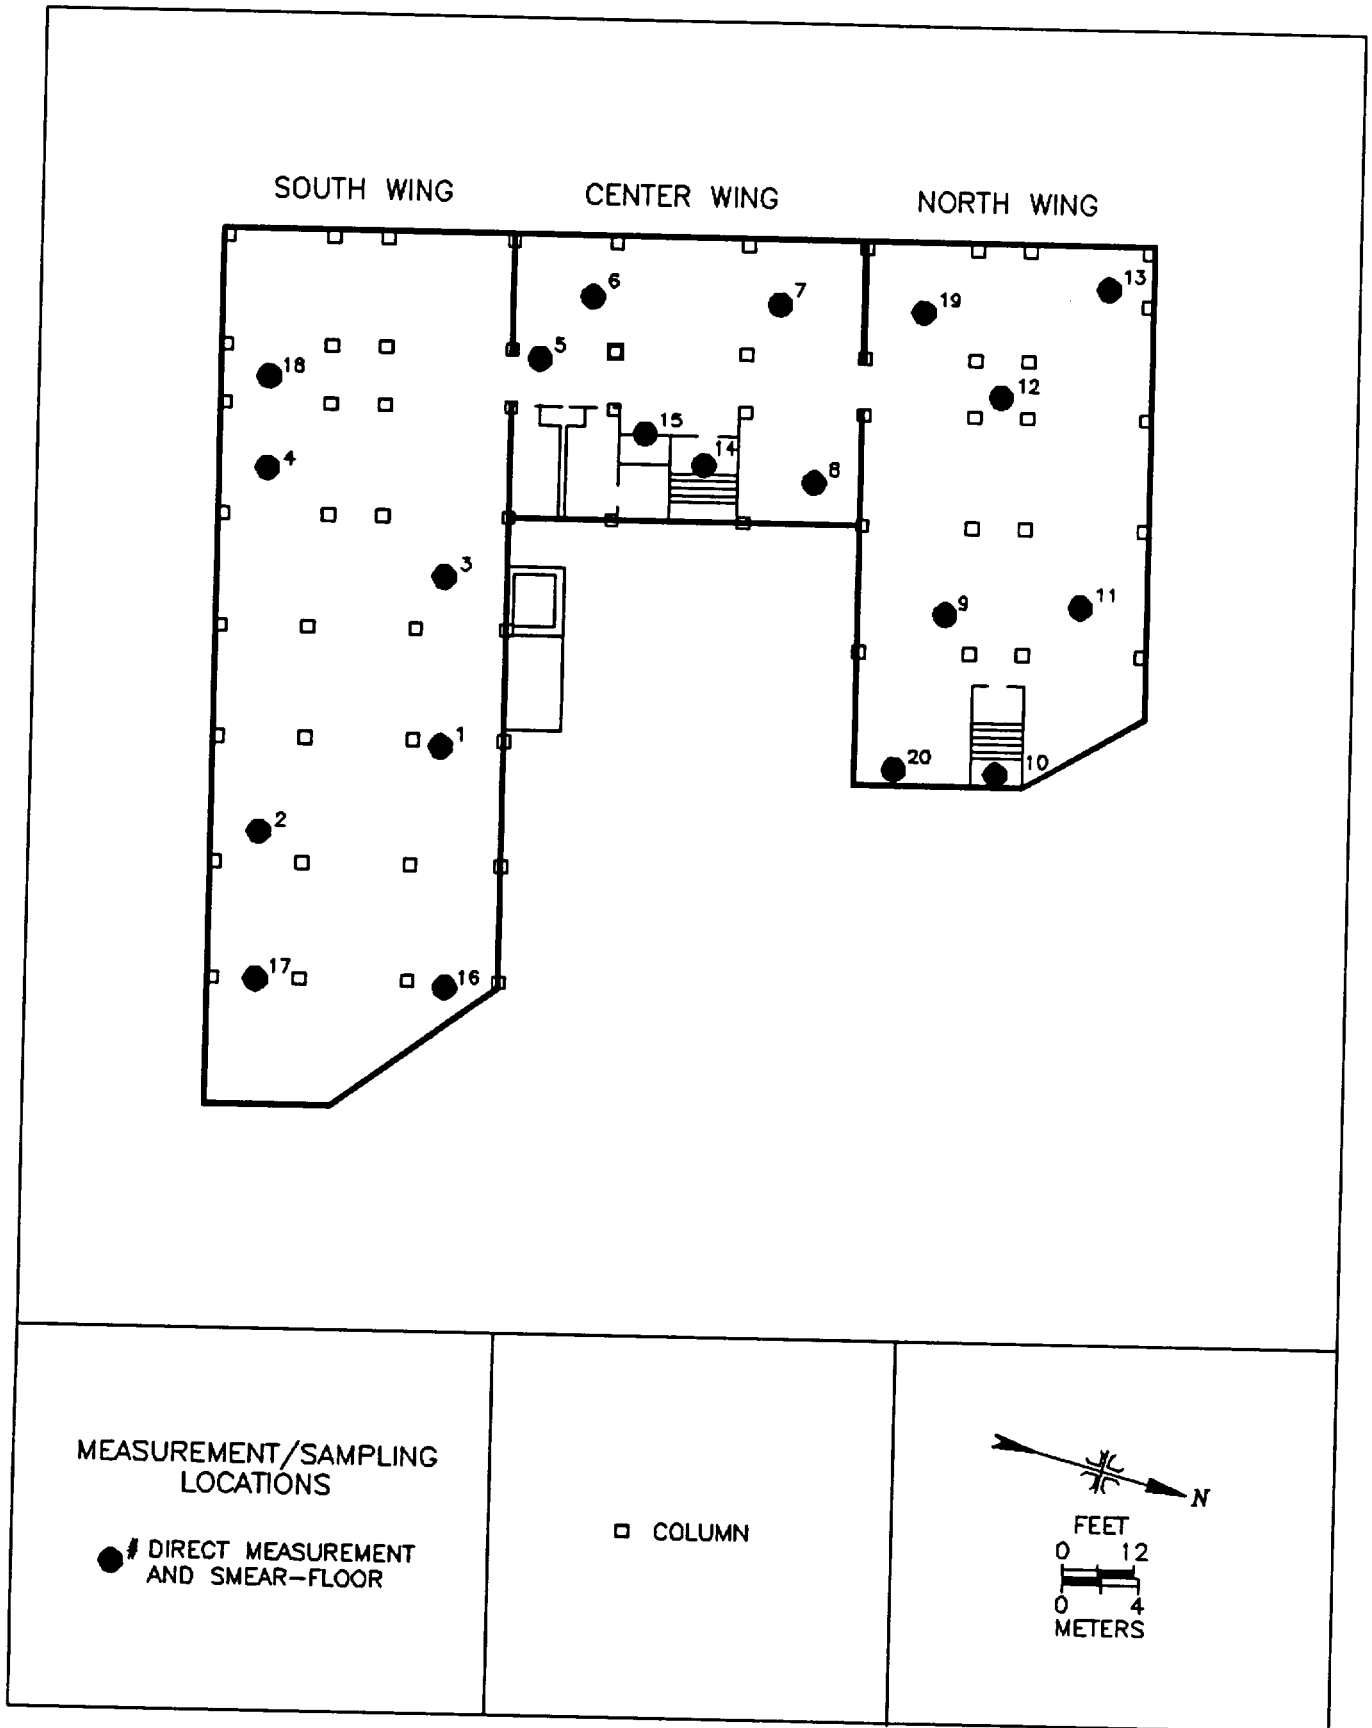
Building 7, Fourth Floor – Measurement and Sampling Locations
